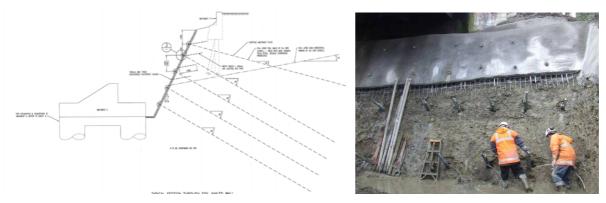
Mohaka Bridge south abutment strengthened using post-grouted soil nails
